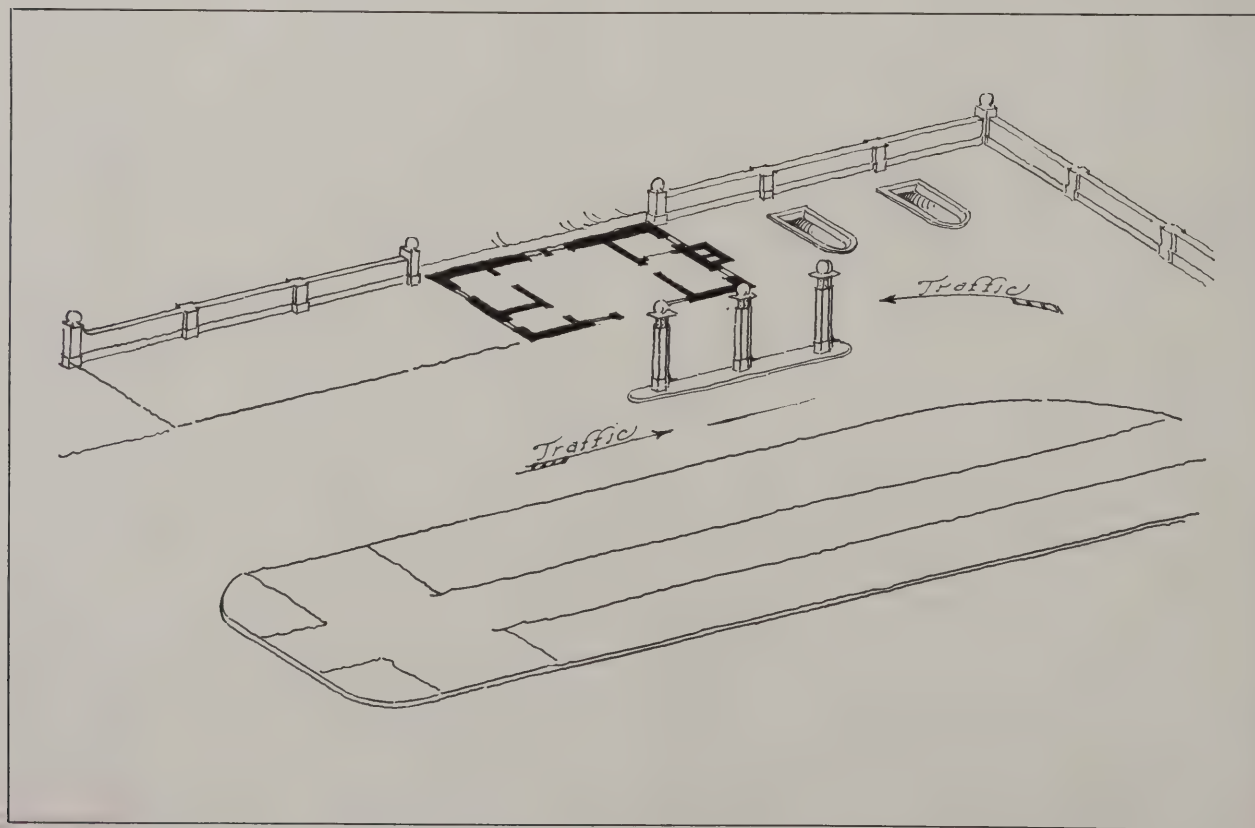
Plot Plan Showing Good Arrangement for Corner Location. Easy Access to Pumps, Pits and Service Building and Ample Two-way Traffic Spaces Are Provided
